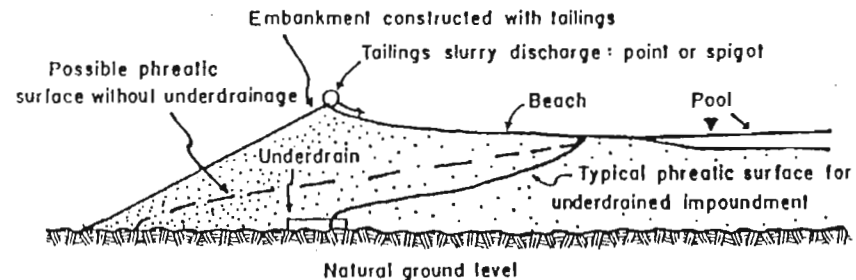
Typical Section of Upstream Constructed Tailings Impoundment
